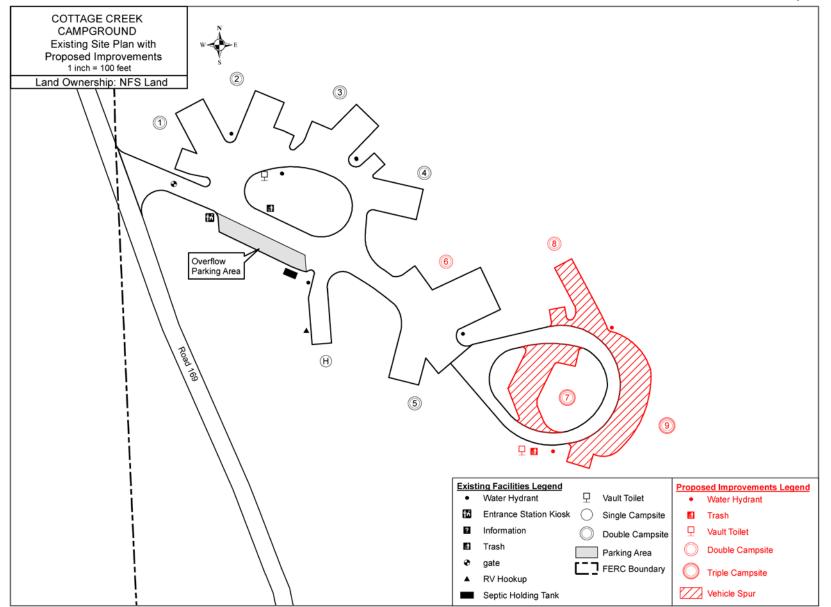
Existing site plan with proposed improvements for Cottage Creek Campground.
